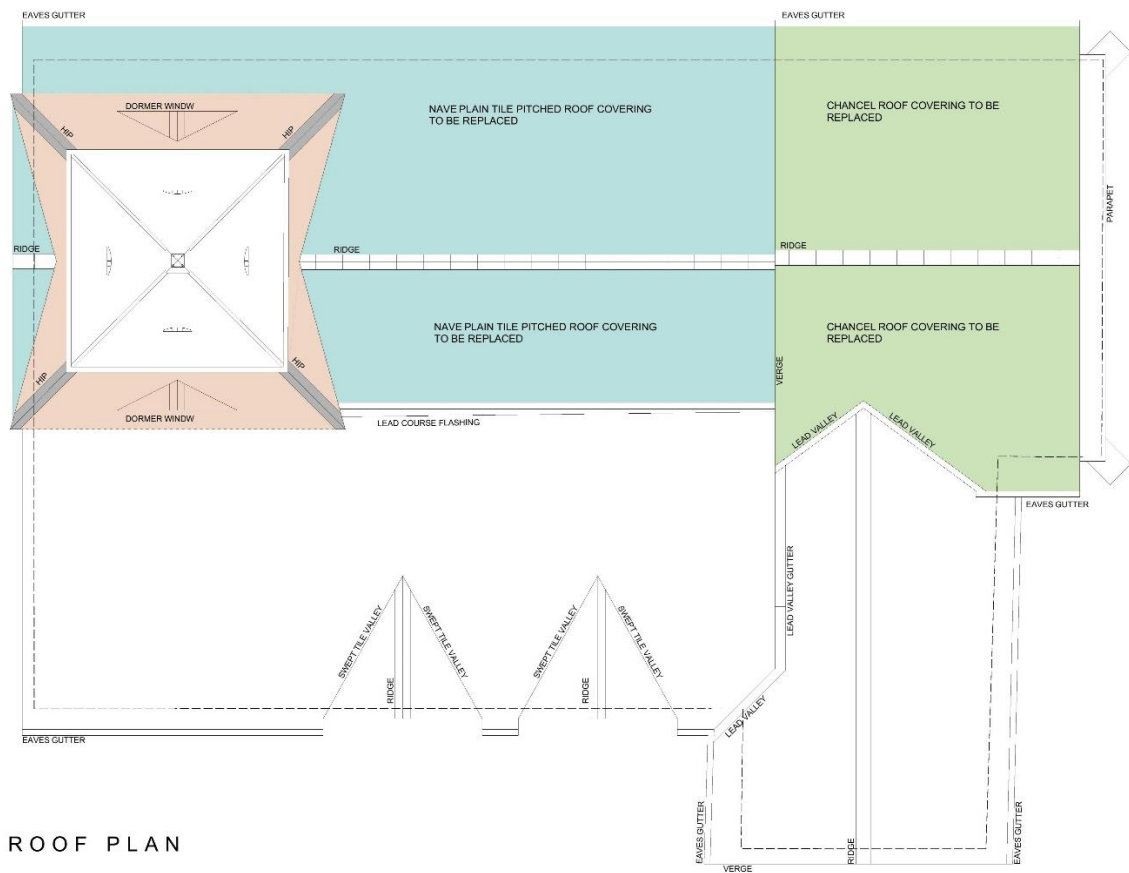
Extract from application drawing showing the proposed roof works (NTS).
